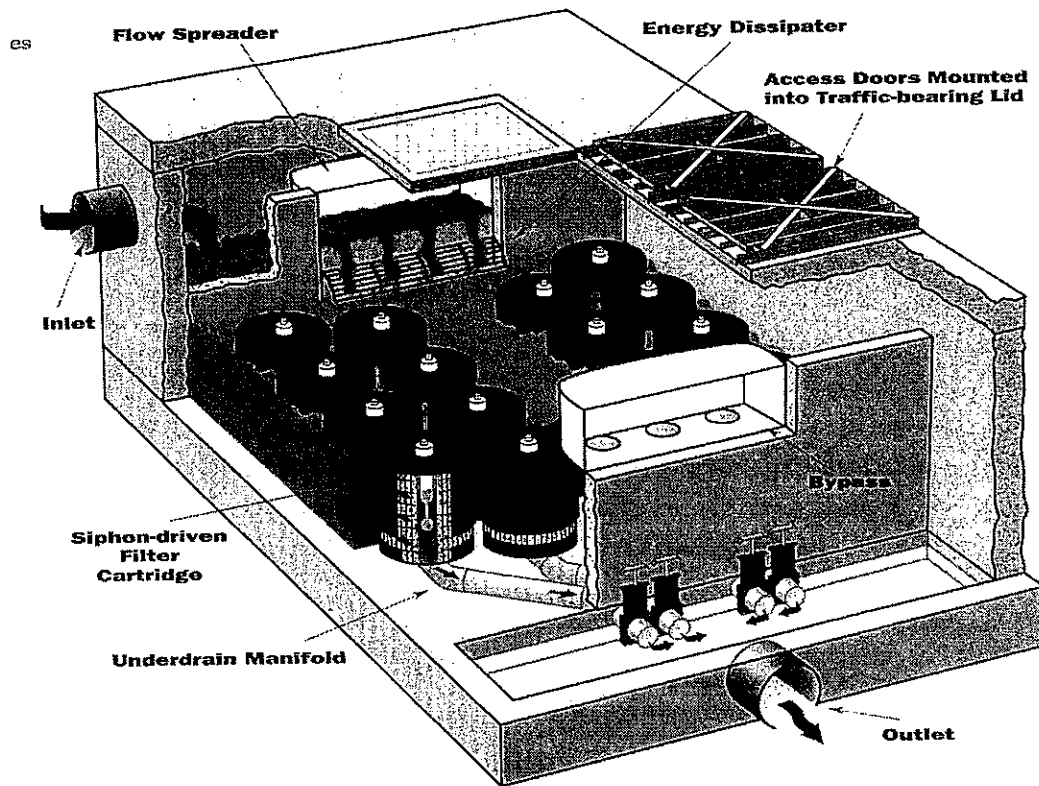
Typical StormFilter (Ref: Stormwater Management Inc.)
